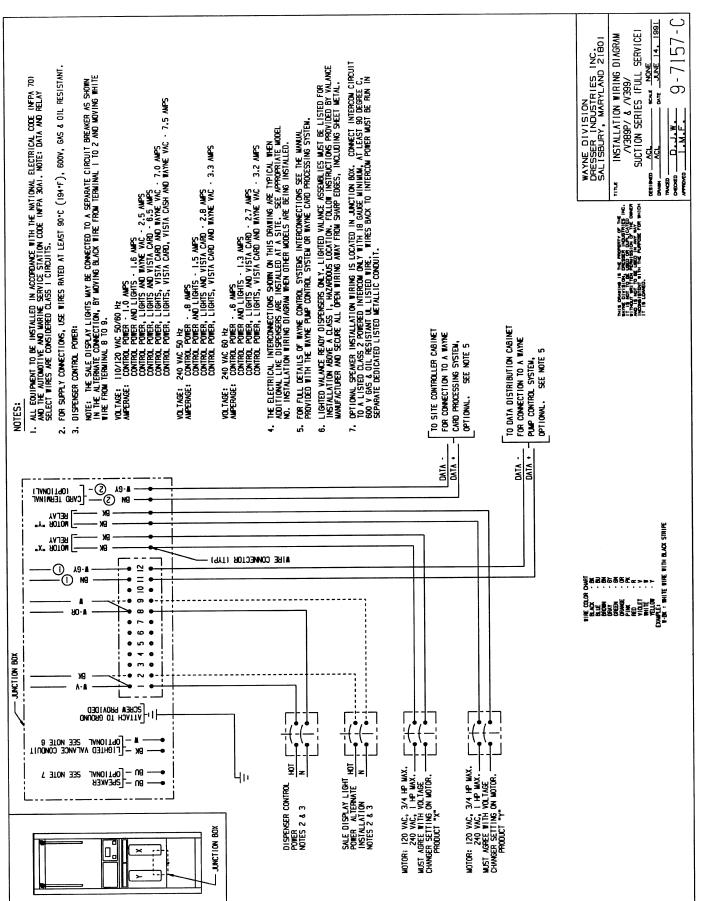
9-7157-C Installation Wiring - 4/V389P and 4/V399P (Suction).
